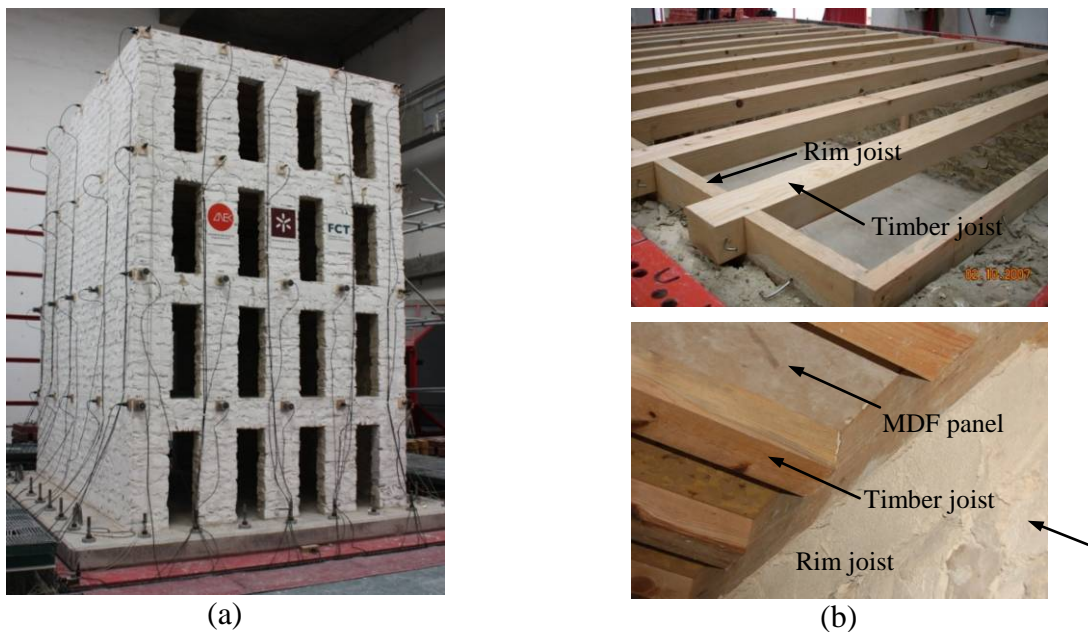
Non-strengthened mock-up: (a) general view; (b) details of the floors.
